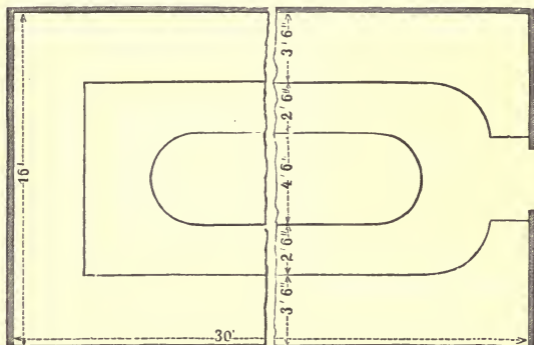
GROUND PLAN OF CONSERVATORY, FIG. 52.
